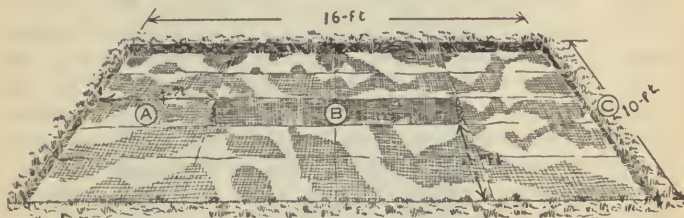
Method of flyproofing latrine pit. A-Oil soaked burlap extending completely around pit. B-Opening of pit. C-Side wall of excavation in which burlap is placed.
